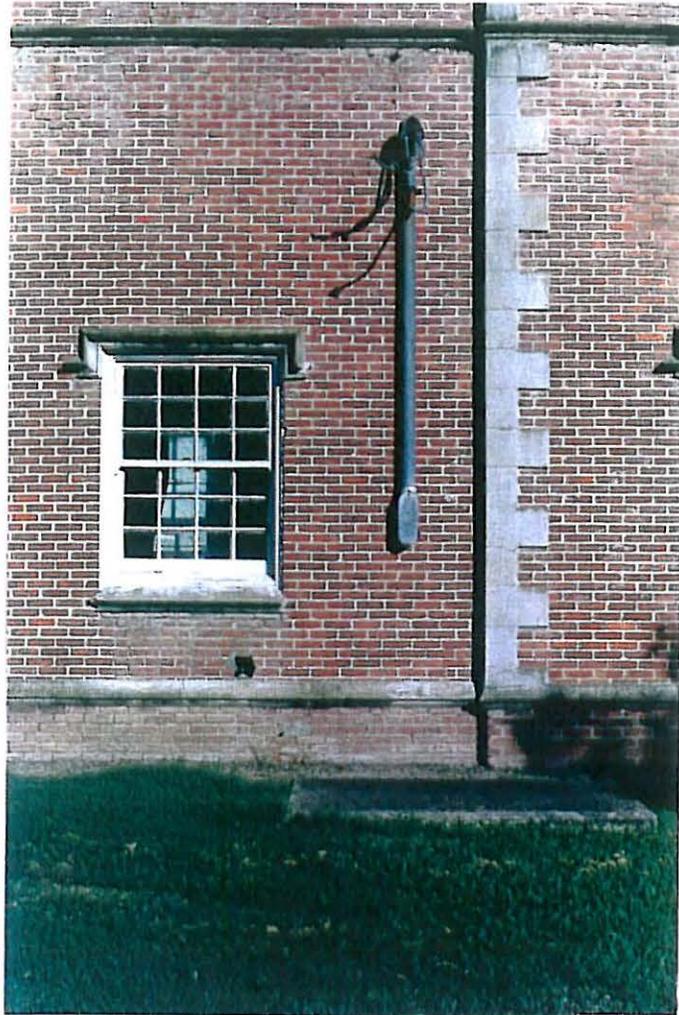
Concrete equipment pad off east wall of gymnasium block. Masonry opening beneath window suggests possible routing of electrical and coolant lines. Note also the abandoned service entry conduit of the second generation electrical system.
